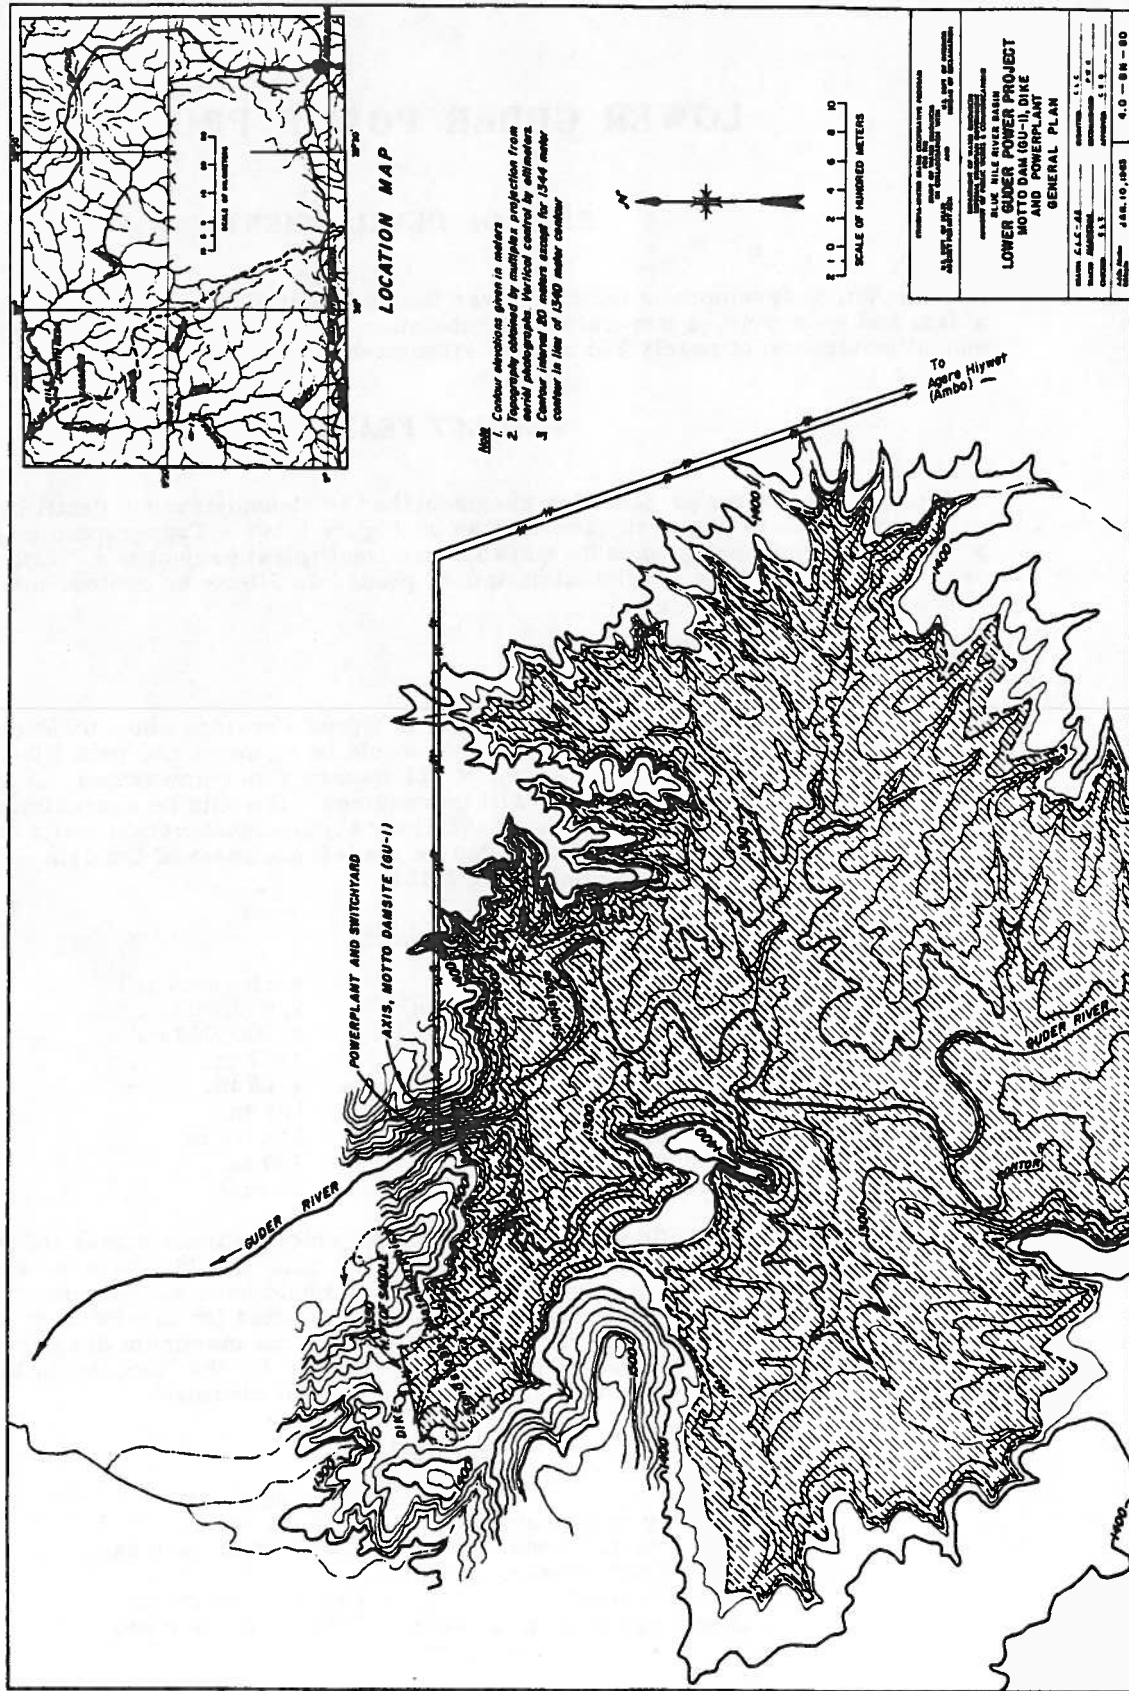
Motto Dam (GU-1), Dike, and Powerplant--General Plan
